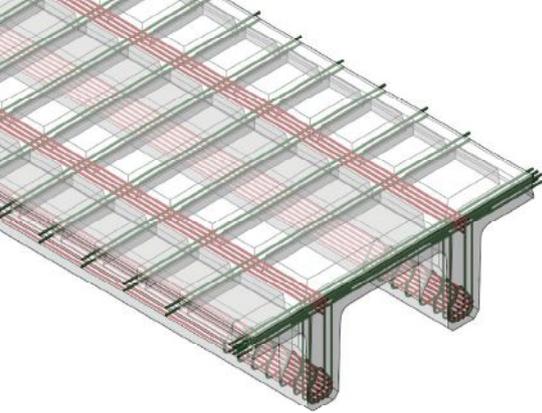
Isometric view of the end of the optimized UHPC twin-stemmed beam from above. Reinforcing bars and prestressing strands are shown. Figure: e.construct.
